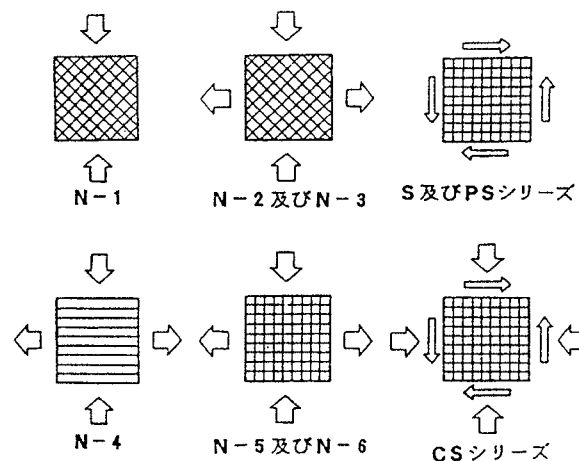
Reinforcement arrangement and loading principle of the specimens [91,1]
